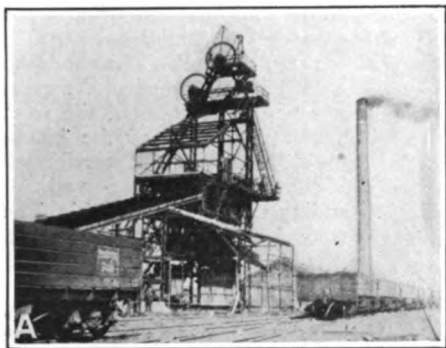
TIPPLE DAMAGED BUT CONCRETE SMOKE STACK STOOD UNHARMED.
